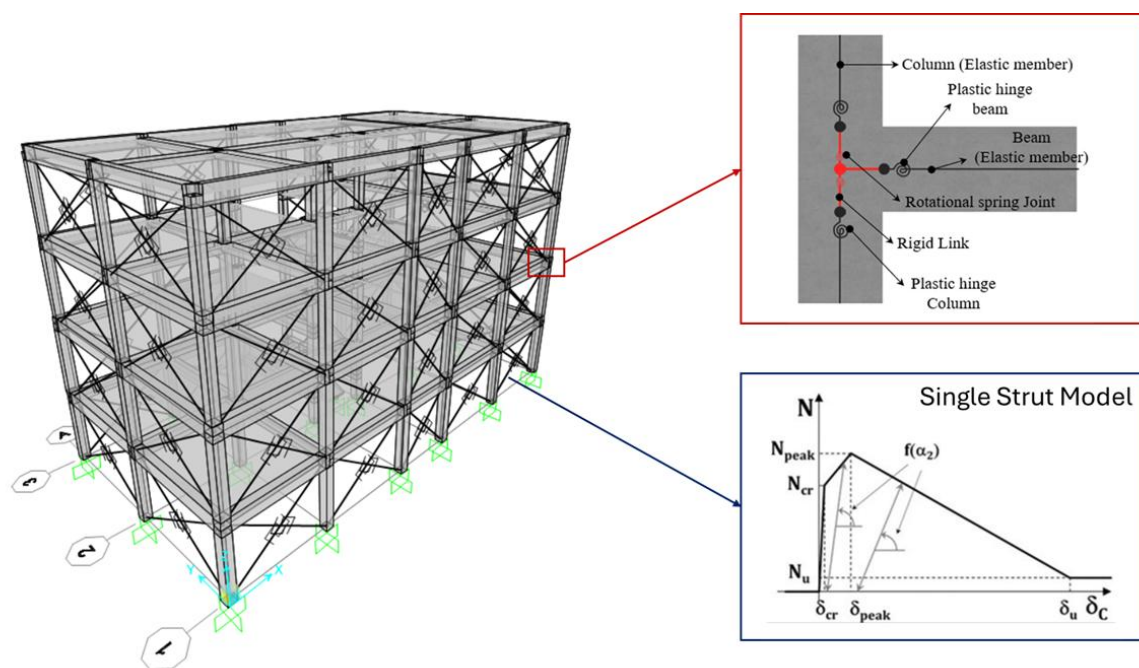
Modelling approach for existing RC infilled frame buildings. Modified after Moliterno et al. 2023 and D'Amore & Pampanin 2025.
